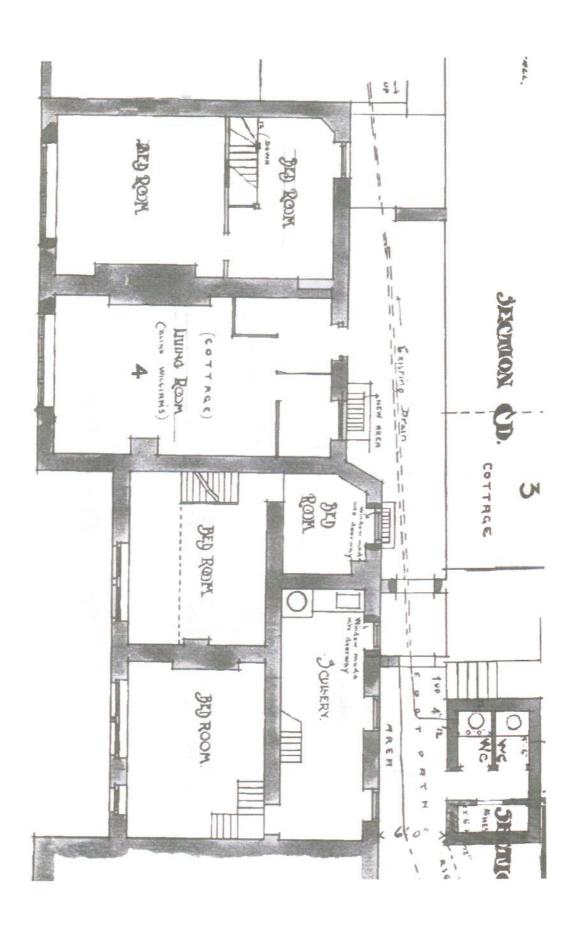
1902 remodelling- Walshes plans for top floor of pub and cottages.
